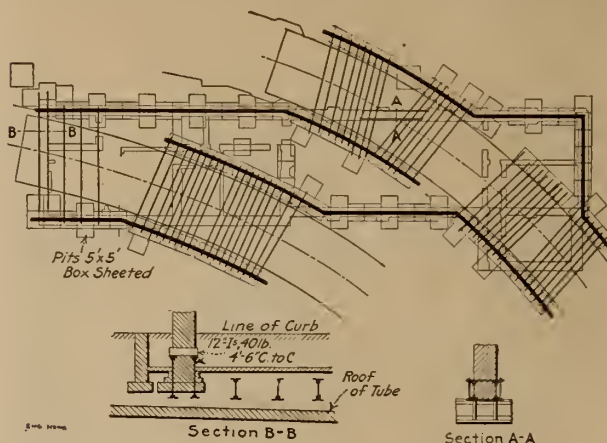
LOCATION OF SUBWAY TUNNELS UNDER TRINITY PARISH HOUSE
